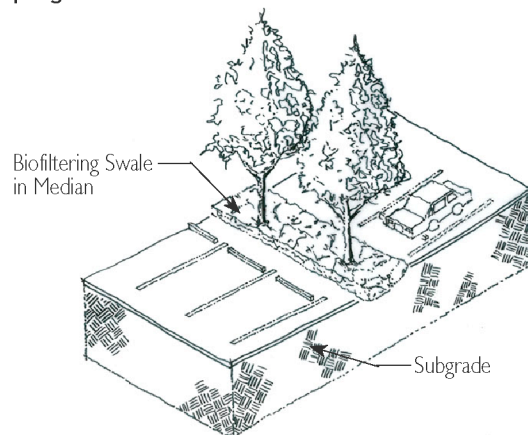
Parking lot with bioswale/tree planting strip.
